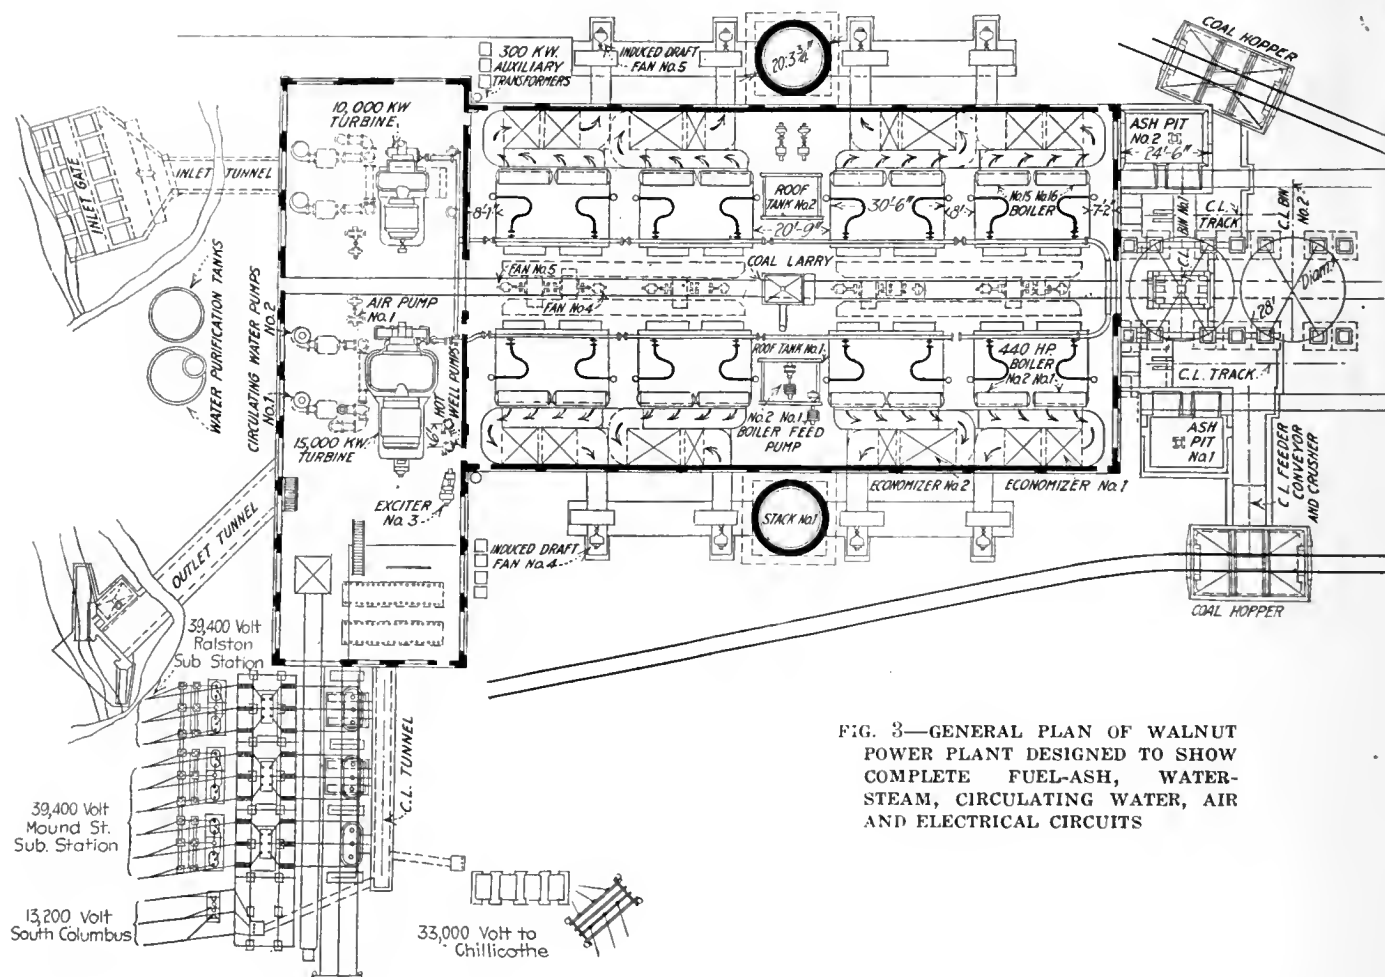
GENERAL PLAN OF WALNUT POWER PLANT DESIGNED TO SHOW COMPLETE FUEL-ASH, WATER-STEAM, CIRCULATING WATER, AIR AND ELECTRICAL CIRCUITS
